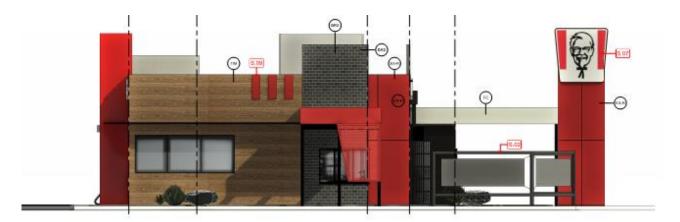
Eastern elevation (Source: Urbis report p.100)
